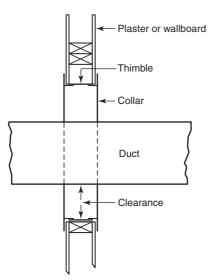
(b) An Arrangement for Passing Ducts Through Combustible Walls or Partitions as Specified in 5.1.2.5.
